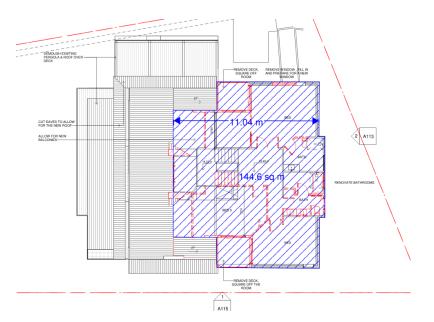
existing floorplate of the upper building level; the floor plate is 11m deep and approx. 144m² in area
